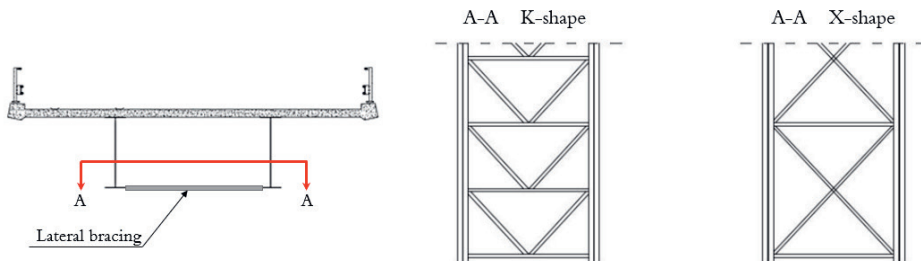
Two types of shapes for the lateral bracing (K- and X-shape).
